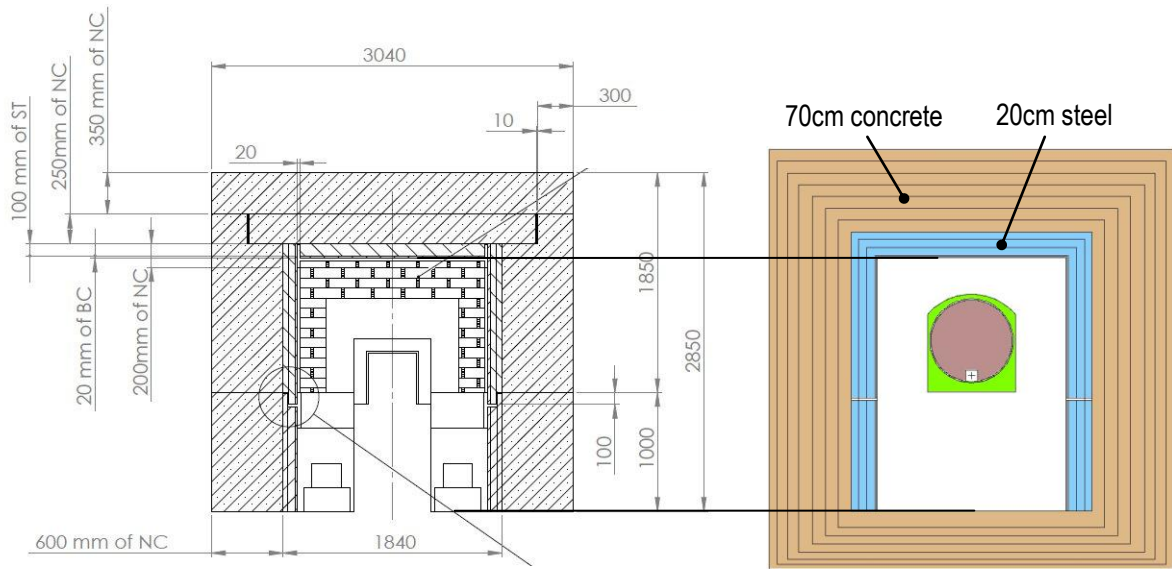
Vertical cut through the chopper pit. Left hand side: Technical drawing. Right hand side: Monte Carlo model (in the Monte Carlo model the shielding thickness is higher as in the drawing)
